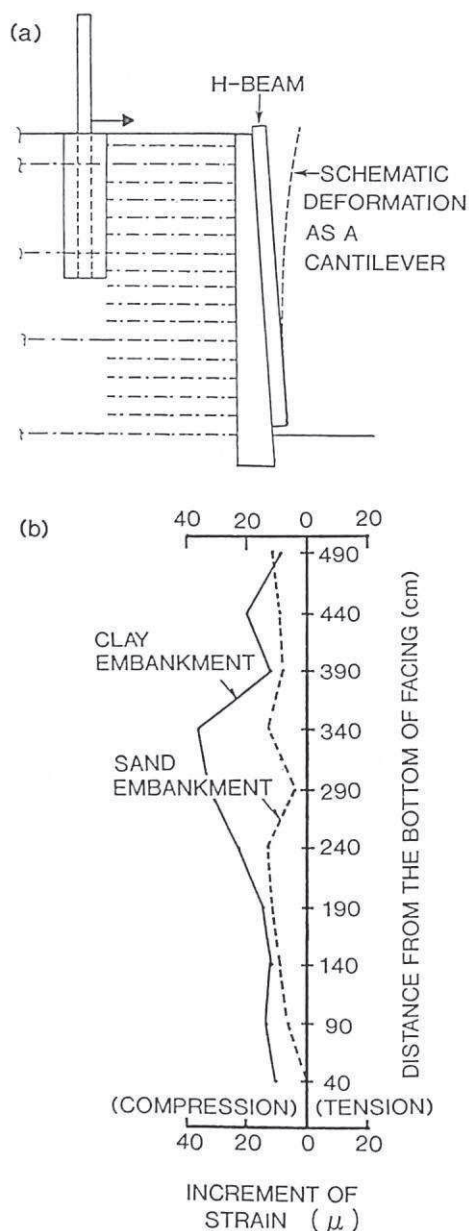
(a) H-beam with strain gauges on the flange in contact with the front face of facing and (b) compressive strains in the flange observed at the peel lateral load applied to the central columns
